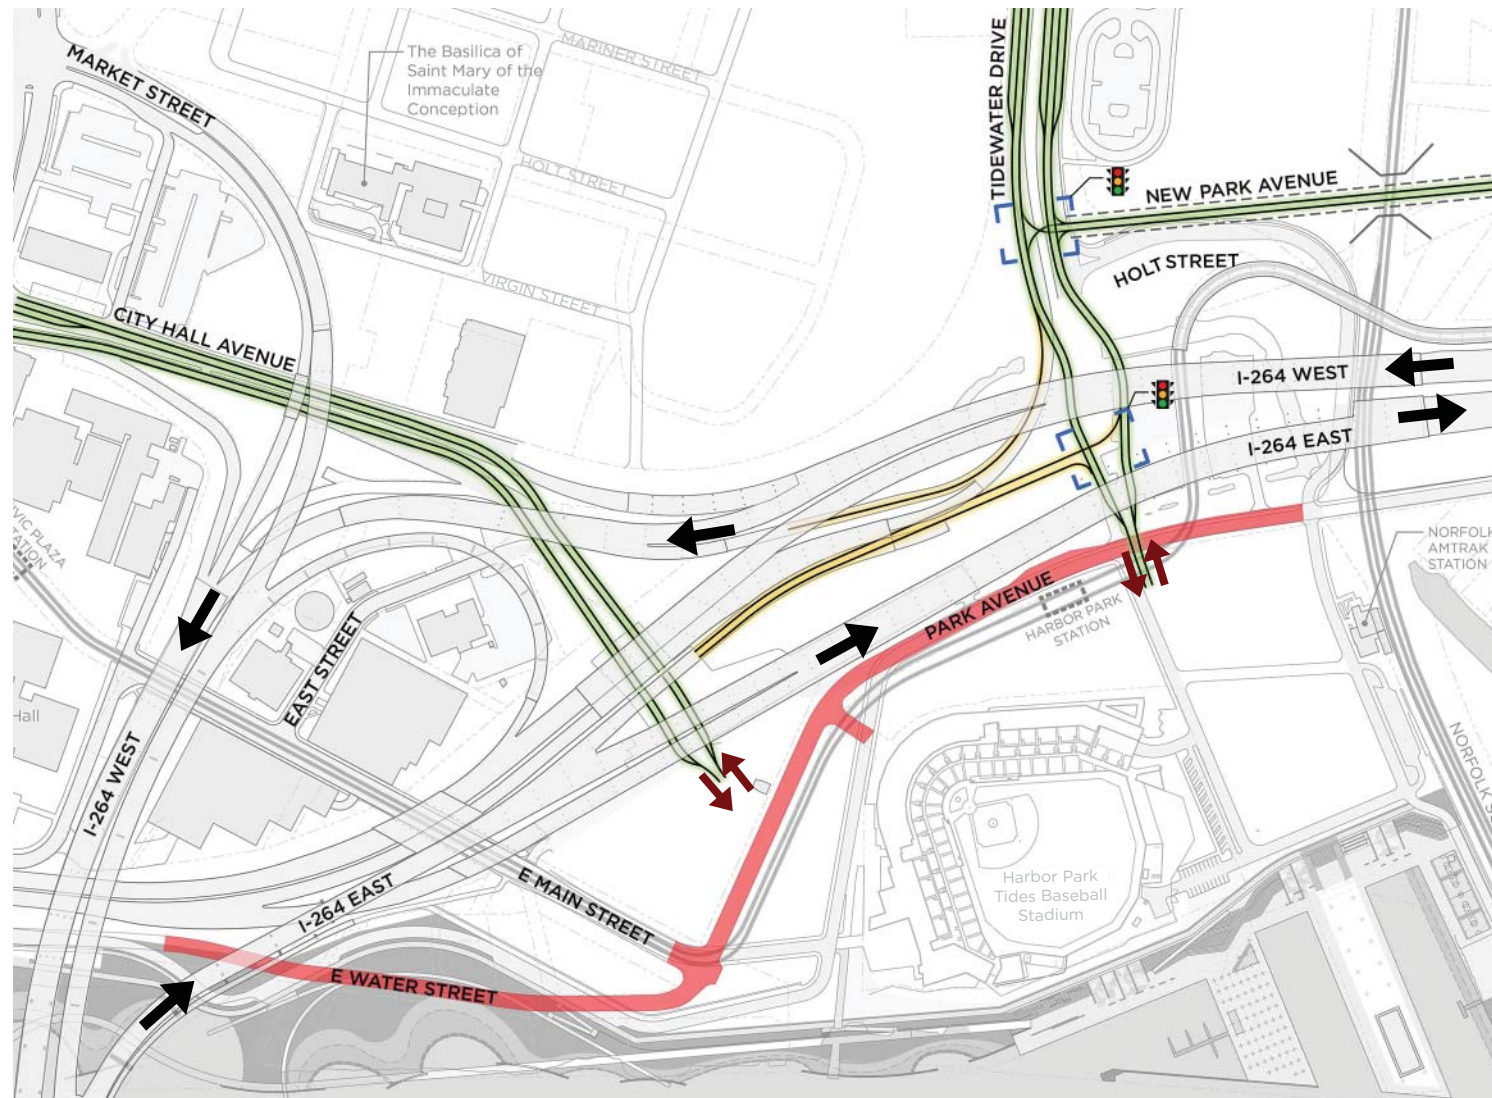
Eliminate and remove existing roadway right-of-way and alignments of E. Water Street and Park Avenue at Harbor Park.
